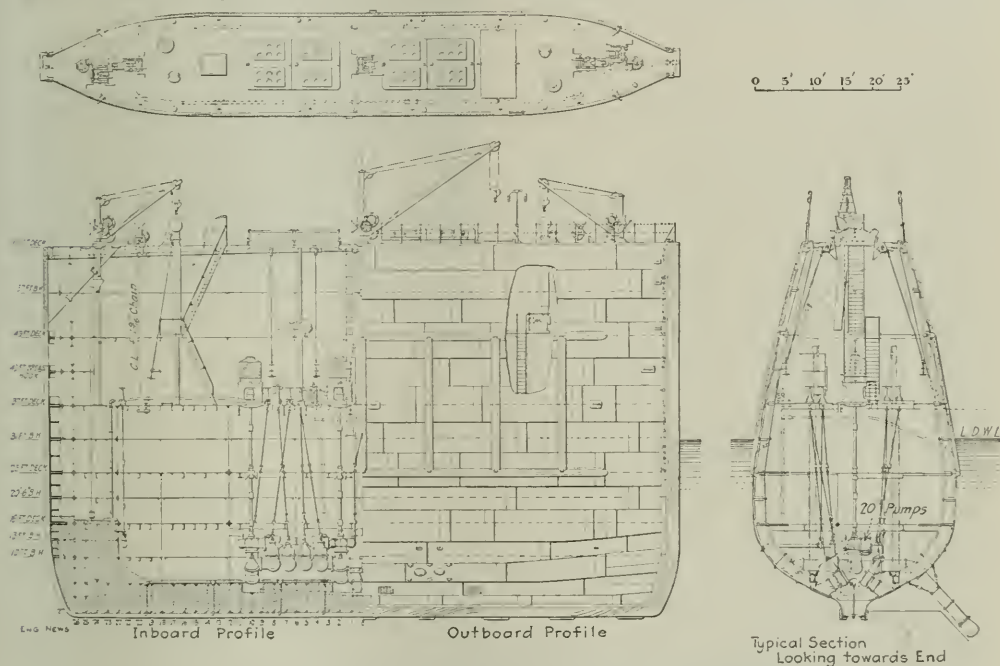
GENERAL SECTIONS, PANAMA CANAL GATE CAISSON
